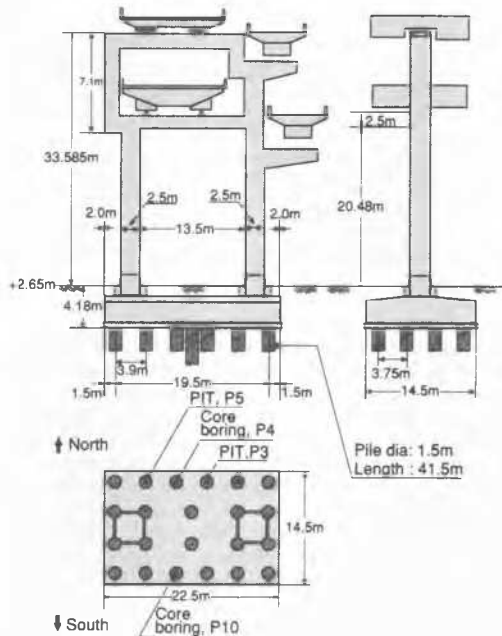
Plan and side views of Pier 211 (Hanshin Highway Authority, 1996)
